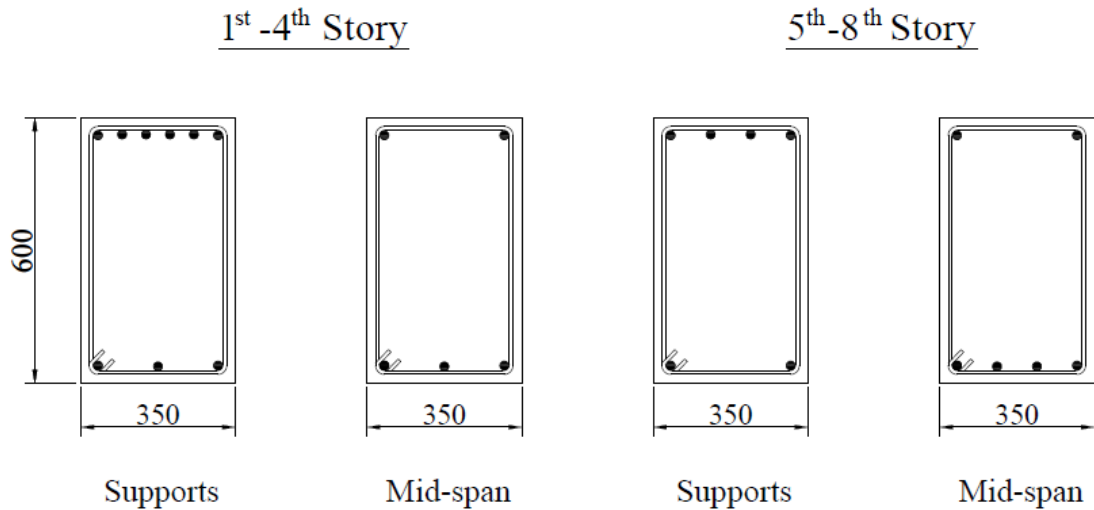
Cross Sections for Beams of 8 Story Irregular Frame
